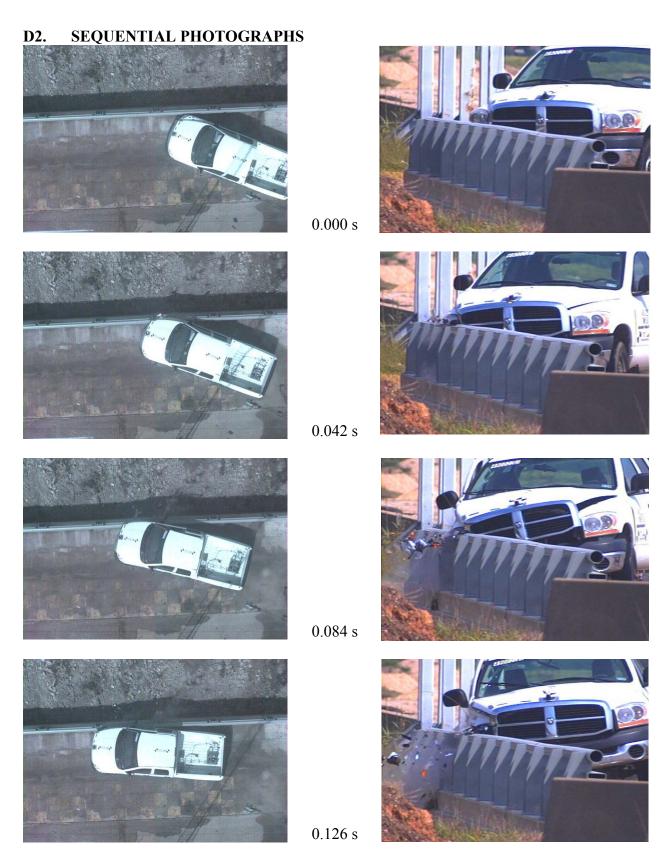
Sequential Photographs for Test No. 490022-3 (Overhead and Frontal Views).
